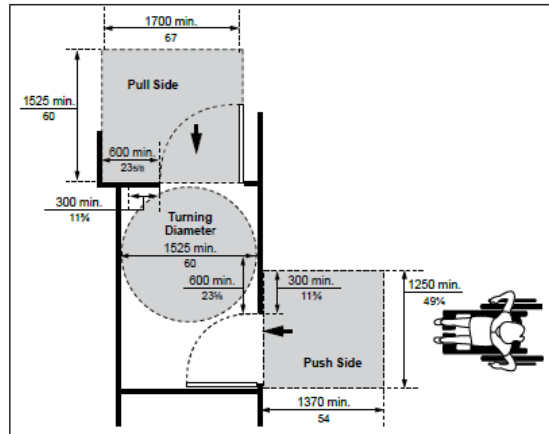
Doors in Series Where Doors are not Aligned - Plan View
